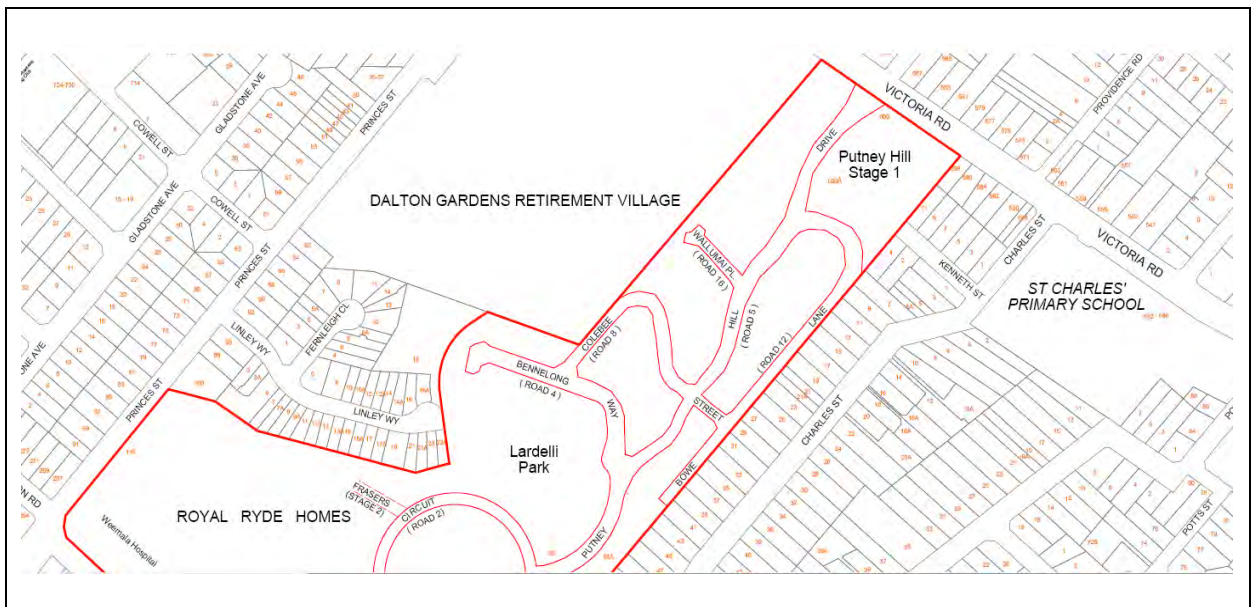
Configuration of proposed roads on Stage 1 of “Putney Hill” estate
